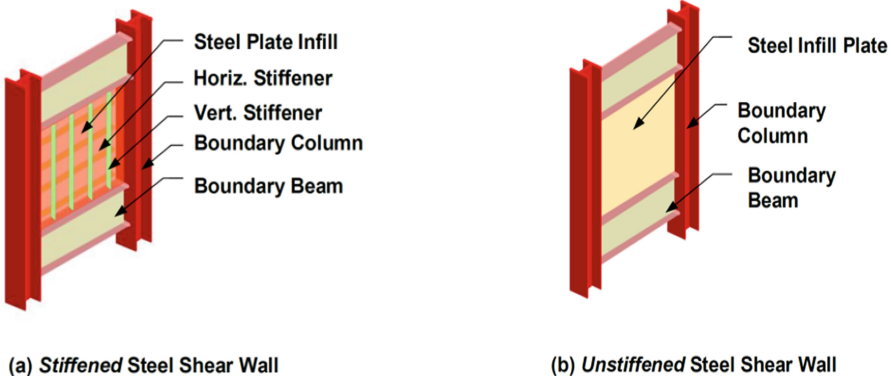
Typical “Stiffened” and “Unstiffened” steel shear walls.
